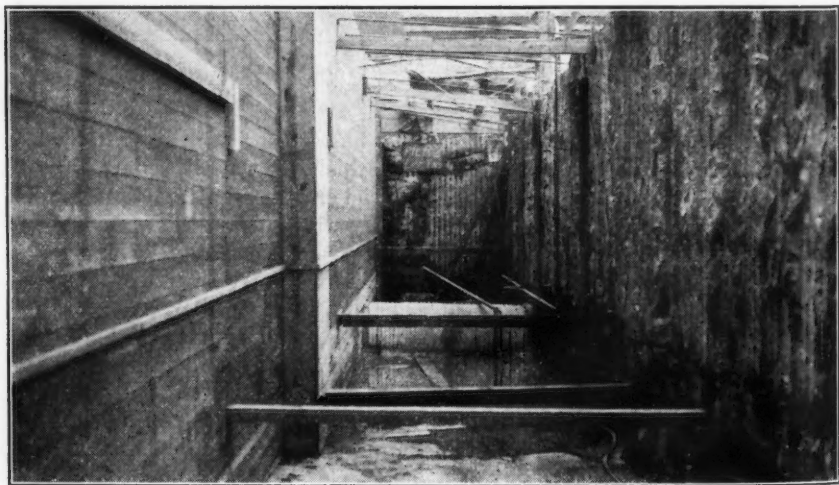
EXCAVATION FOR SPILLWAY PIER NO. 2, SHOWING SHALE SEAM AND SOUND ROCK ABOVE
